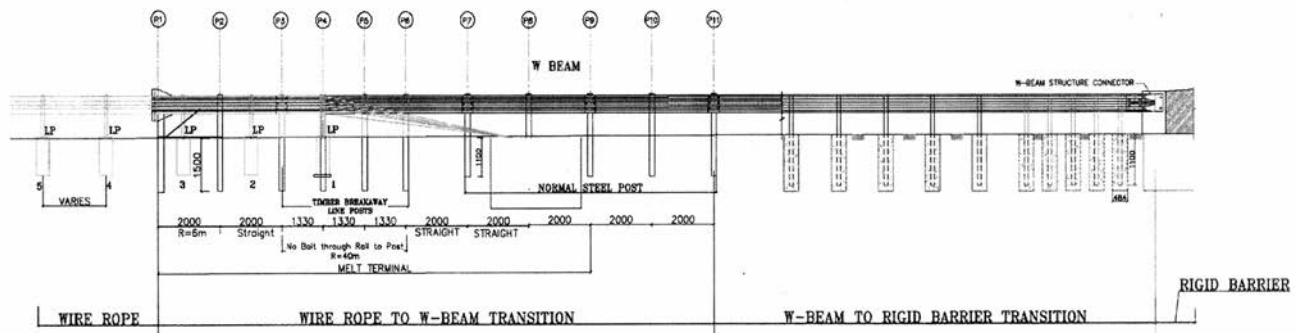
Typical Details on Wire Rope to Rigid Barrier
